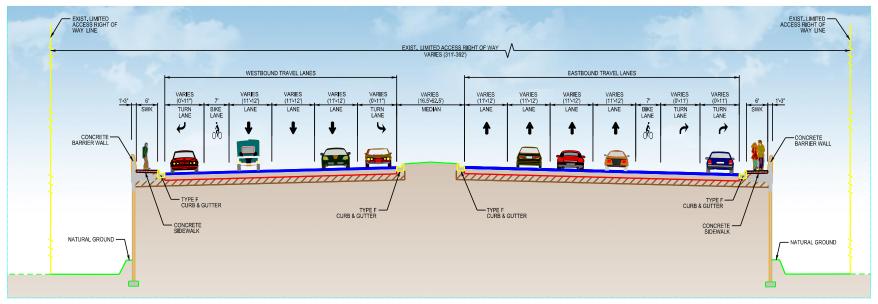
Typical Section - Lantana Road from Sunset Road to SR 9/I-95
